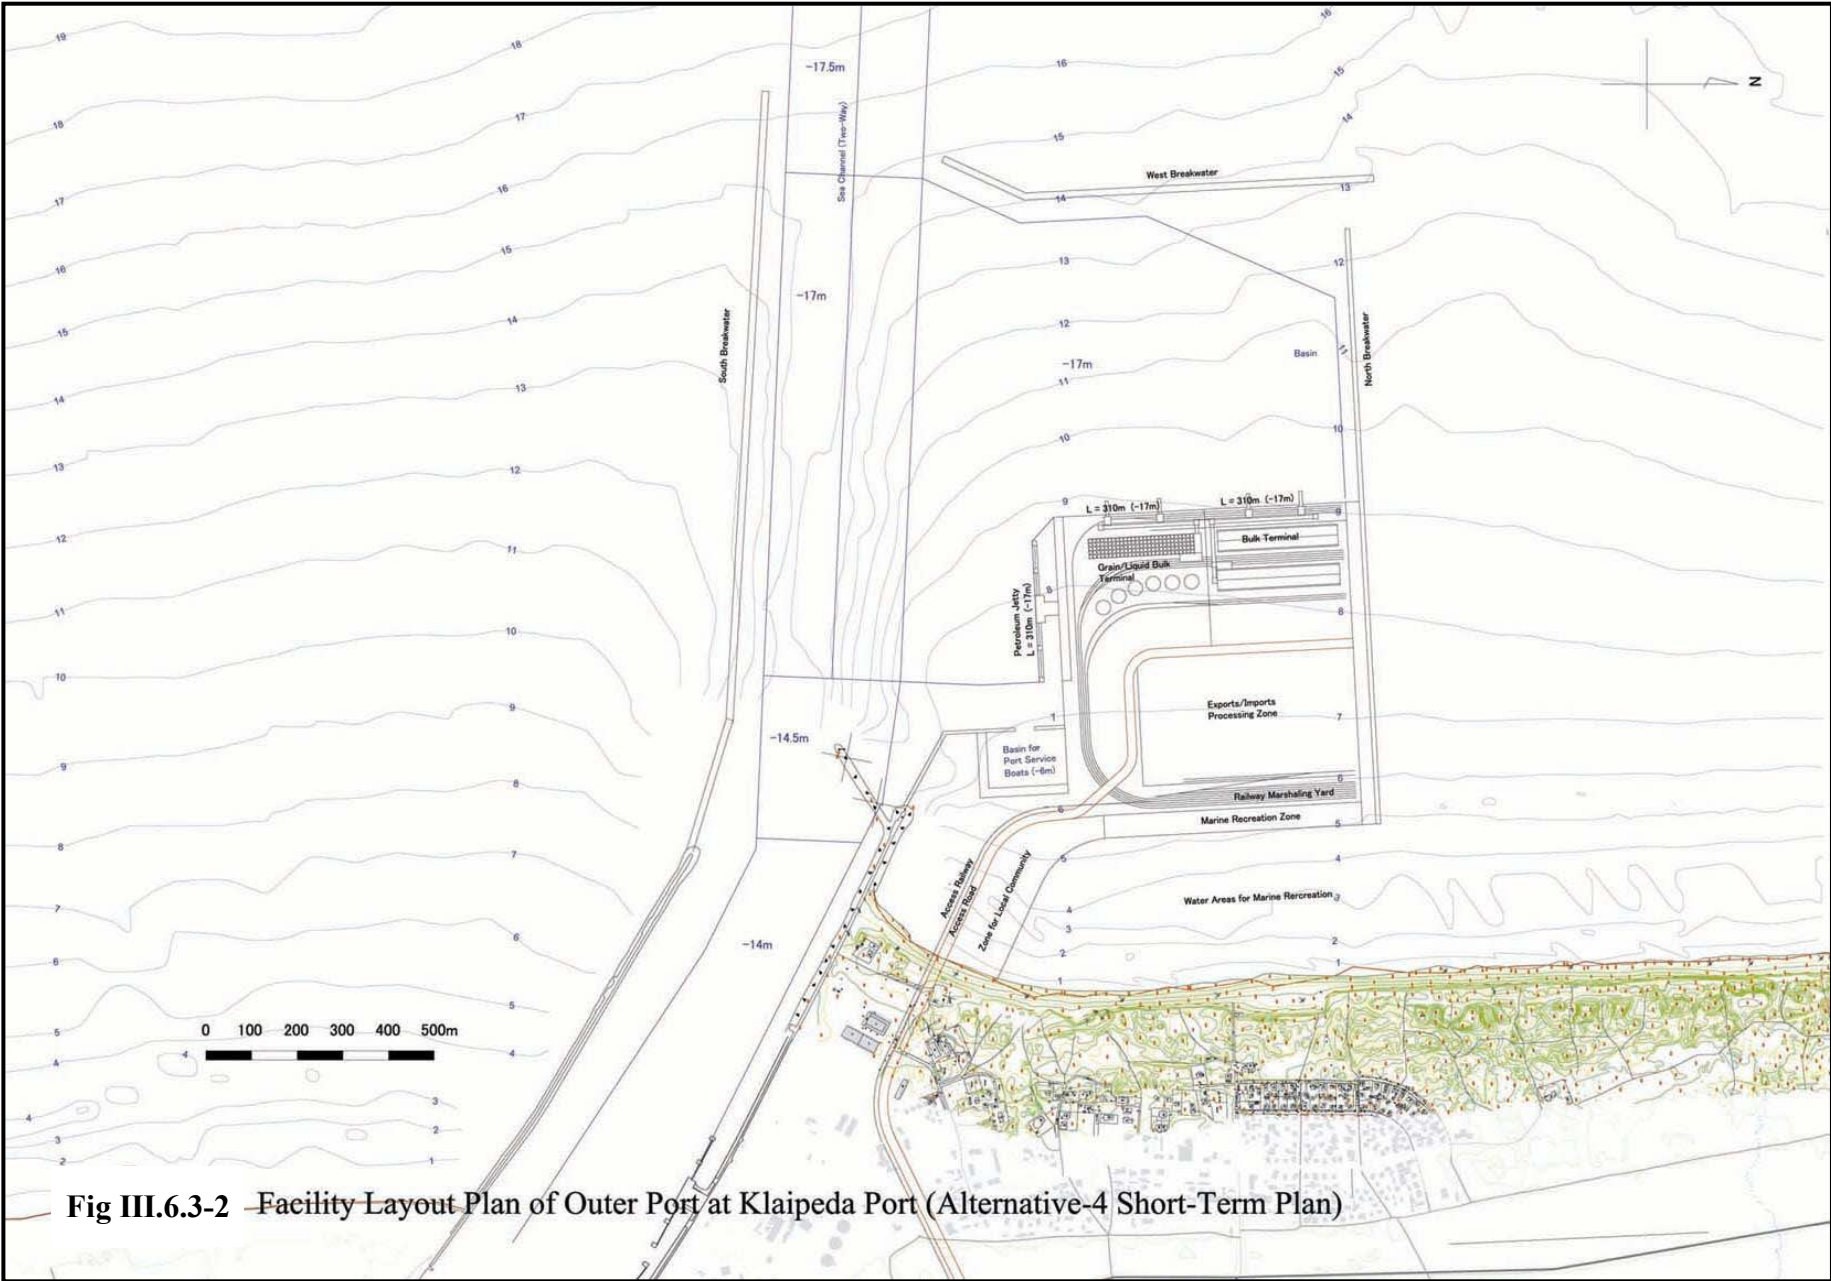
Facility Layout Plan of Outer Port at Klaipeda Port (Alternative-4 Short-Term Plan)
